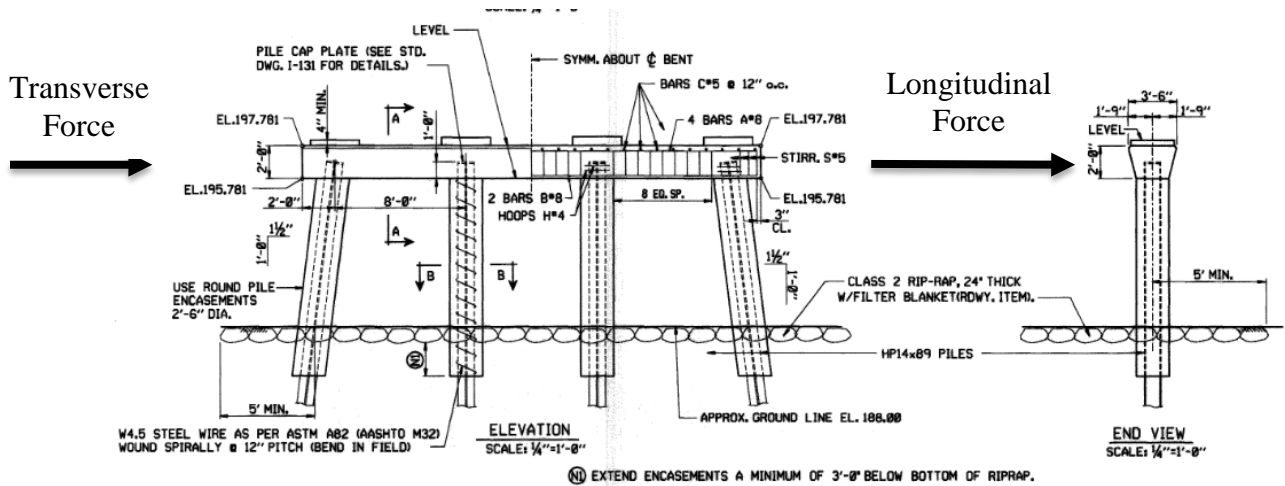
Elevation and End View of Bridge Bent (ALDOT 2013)
